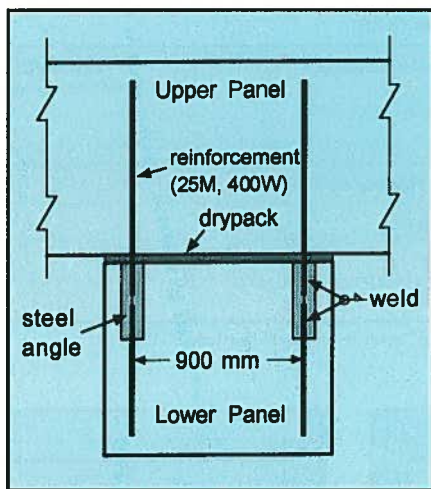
(c). Connection RW — Reinforcing bar with welded connection.
